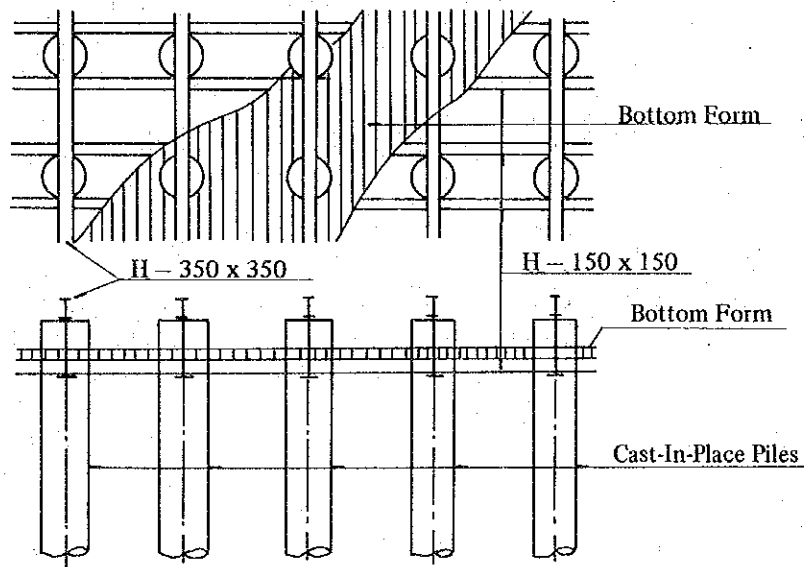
BOTTOM SCAFFOLDING FOR FOOTING
